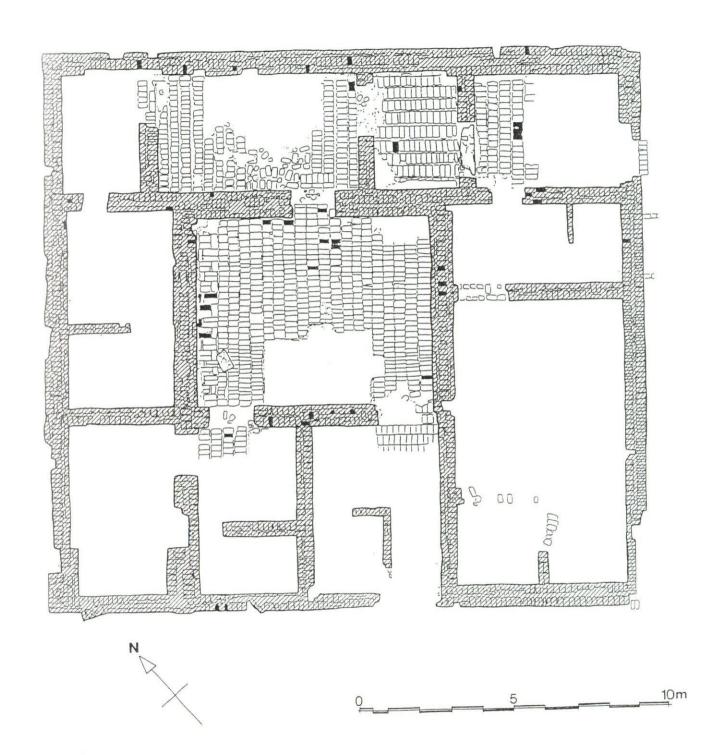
Plan of House A showing the distribution of stamped bricks with the name of Amenhotep III
